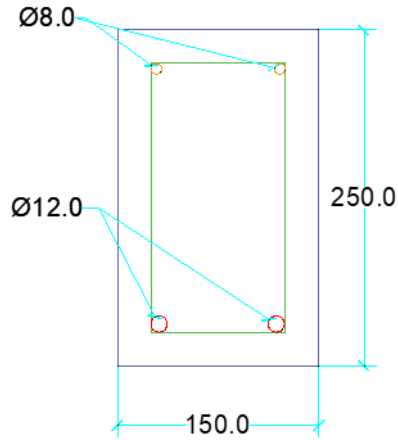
Detail of cross-section on normal beam (all dimensions in mm).
